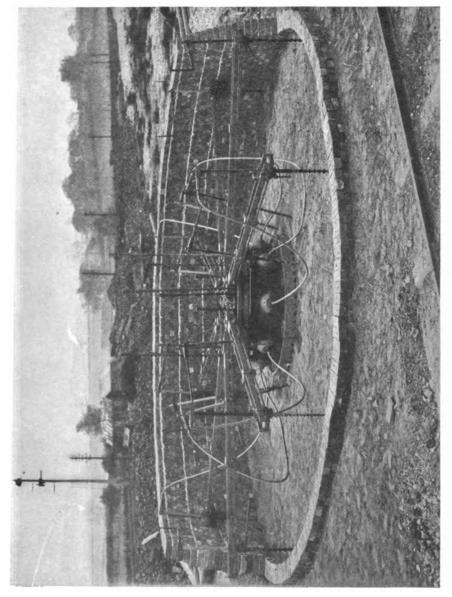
WALKER'S SYSTEM OF SHAFT SINKING WITH ROTARY BORING MACHINES. Machine opened Ready for Boring Operations.
